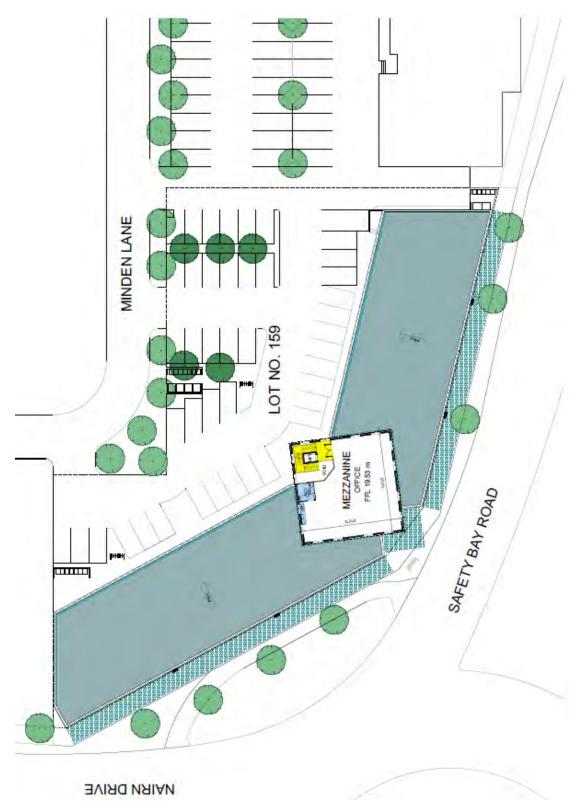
Revised (Current) Second Floor Plan (8.6.2015)
